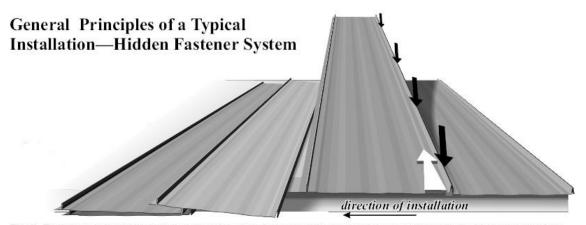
Each panel should be installed over the extended eave drip, pressed down and attached with the appropriate fasteners, and eave hems finished before installing the next panel.
